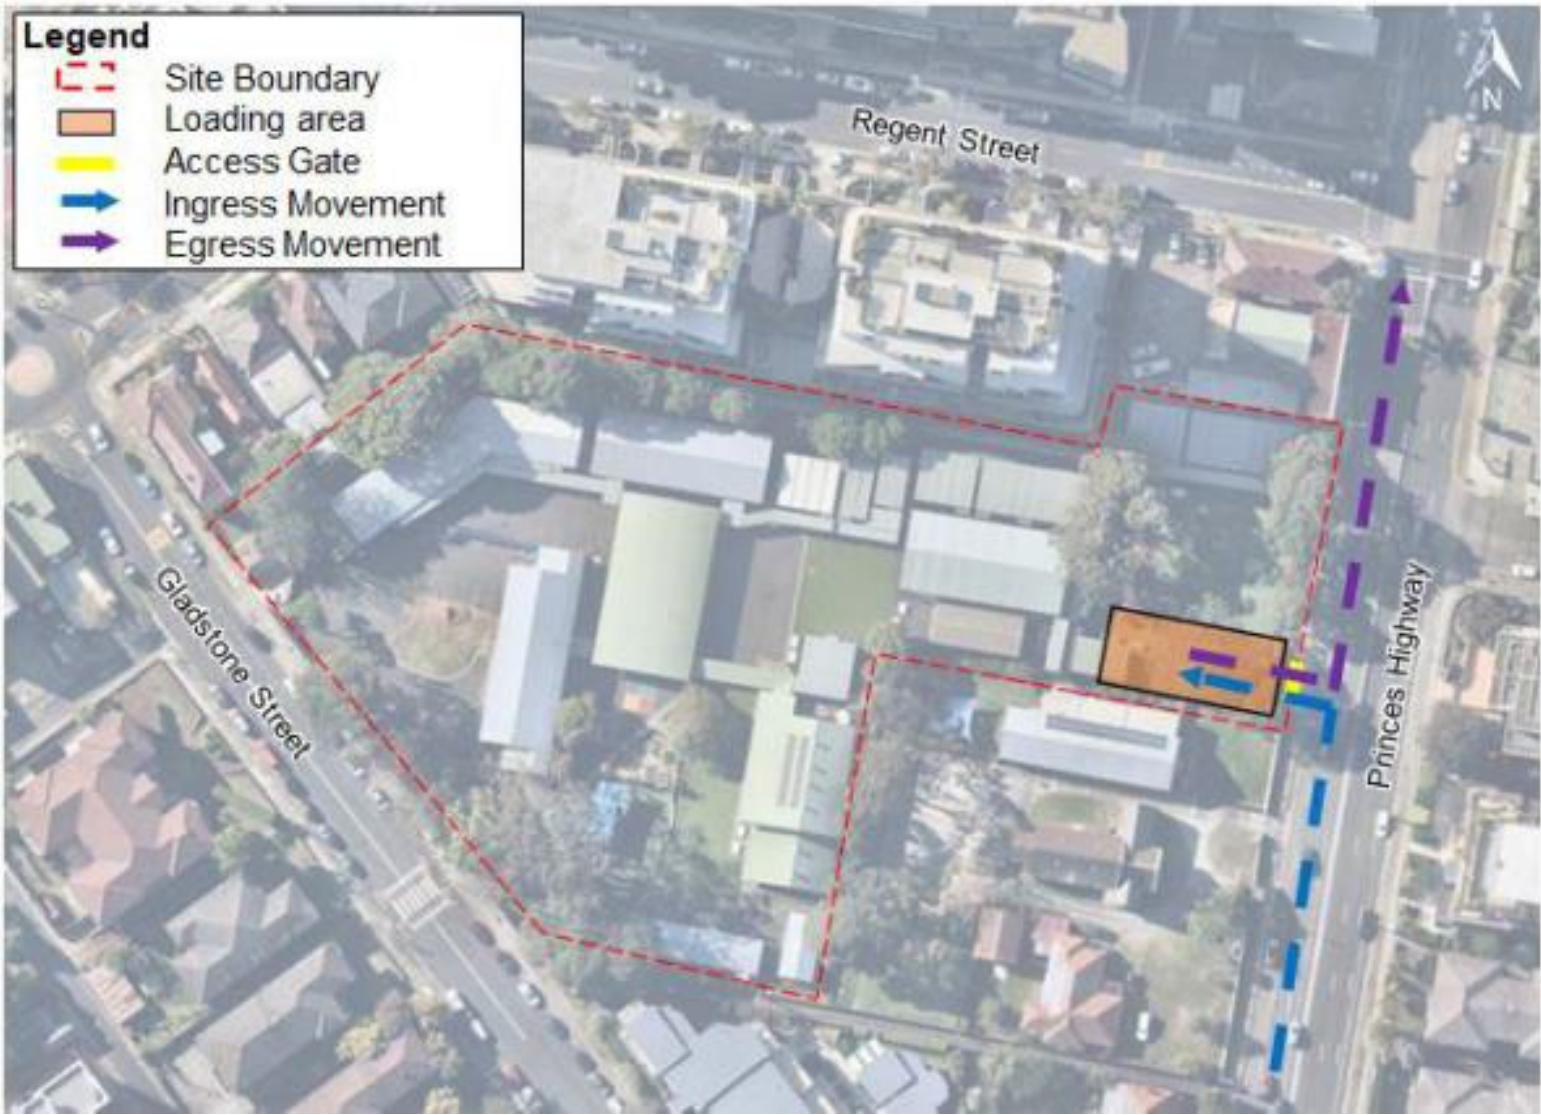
Proposed Construction Site Establishment Plan - Turntable Option
